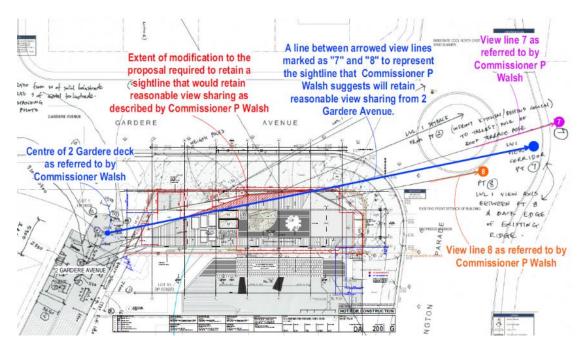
sketch plan DA SK-00. This is the key view sharing assessment plan considered in the court hearing
